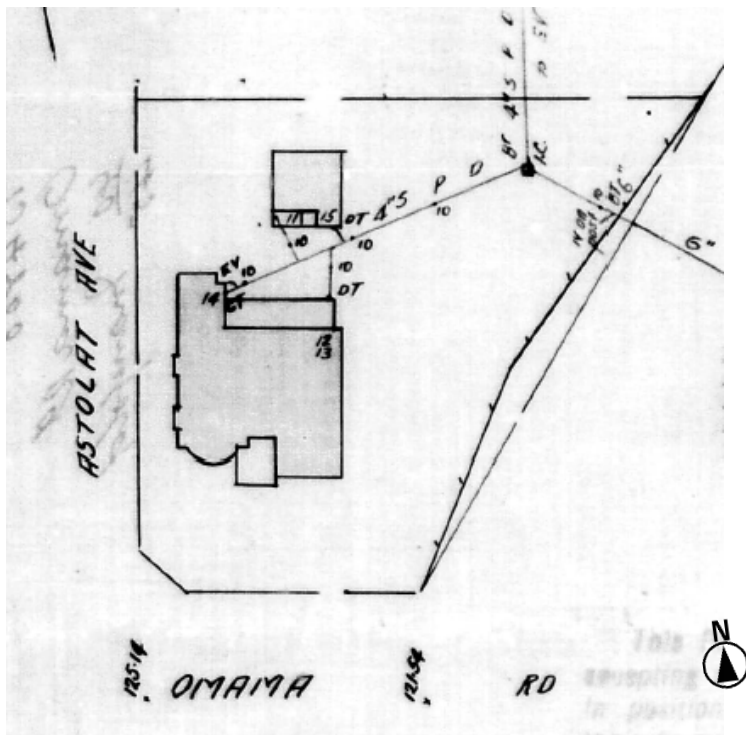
Drainage plan dated November 1926, showing a footprint of the house at 30 Omama Road (Lot 6) (Source: SEW, Drainage Plan No. 154800)
